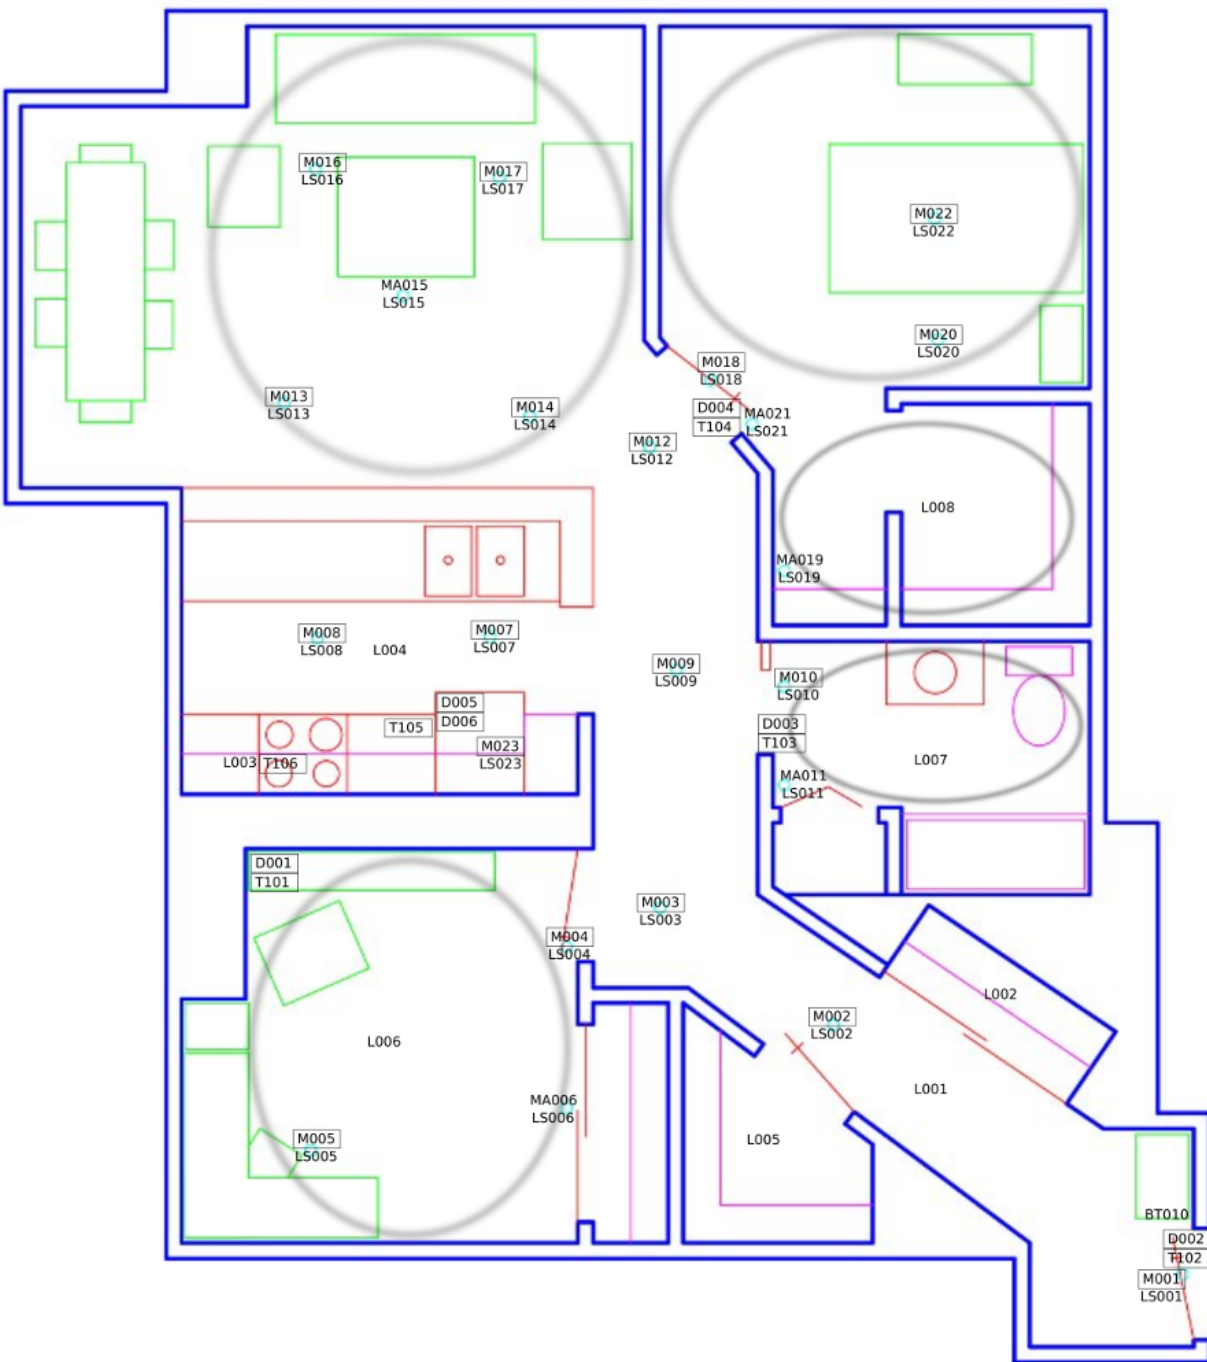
Floor plan and sensor placement for the testbed hh11.
